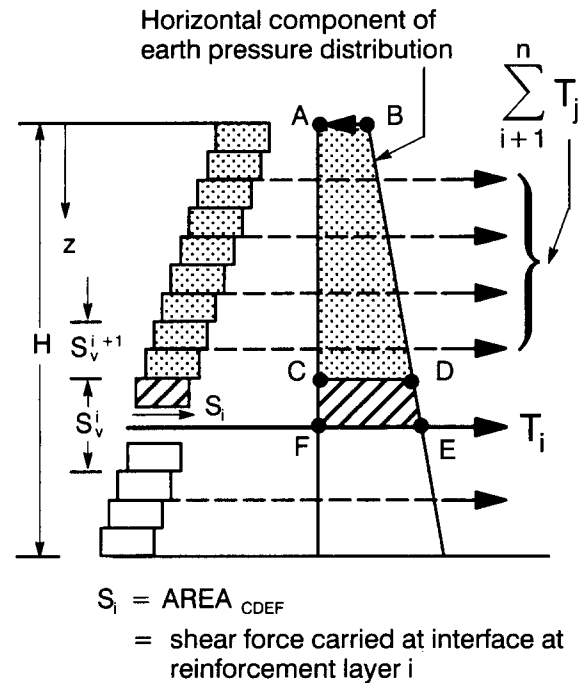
Calculation of interface shear force acting at a reinforcement elevation (n = total number of reinforcement layers)
